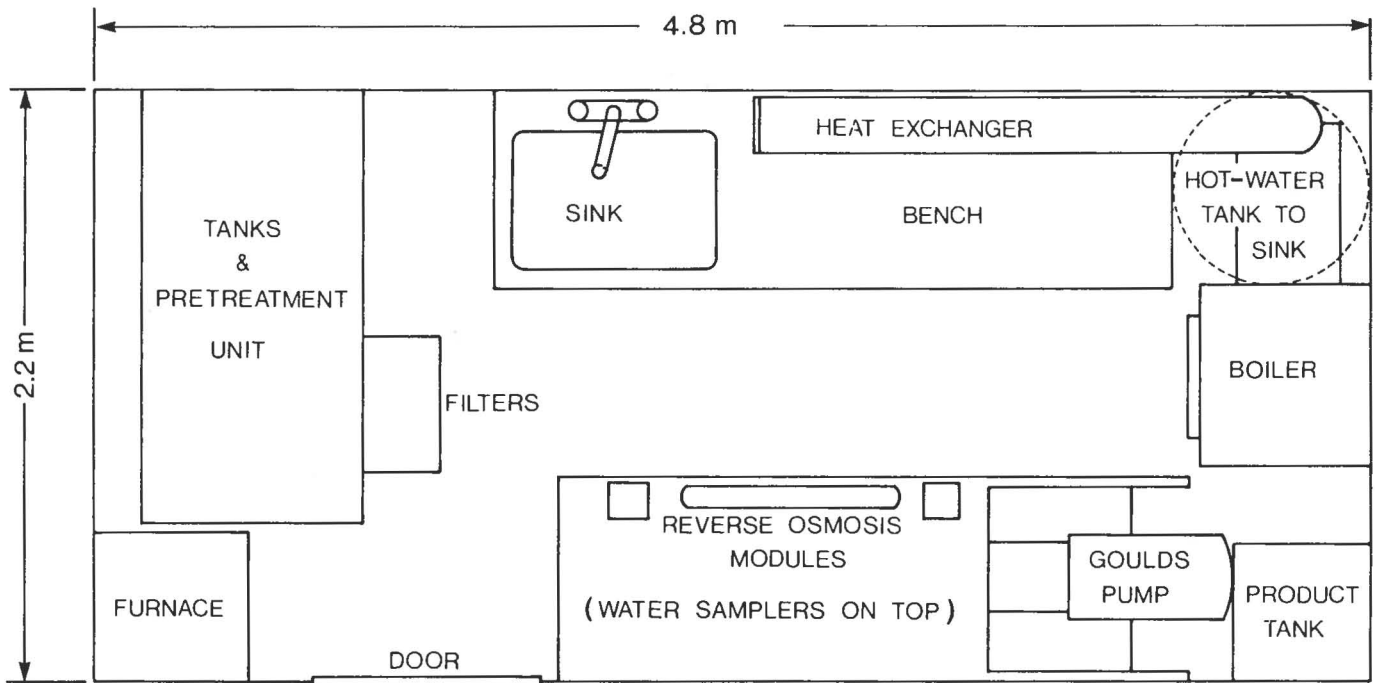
EQUIPMENT LAYOUT IN TRAILER
